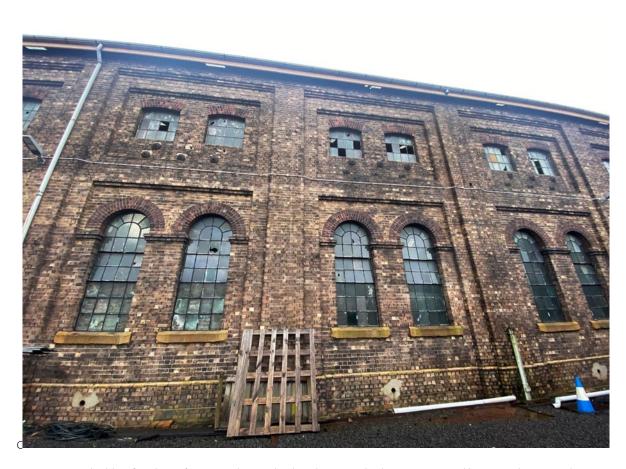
LES building facade configuration showing brickwork, engaged columns, upper and lower window example. Source: Curio Projects, 2022
